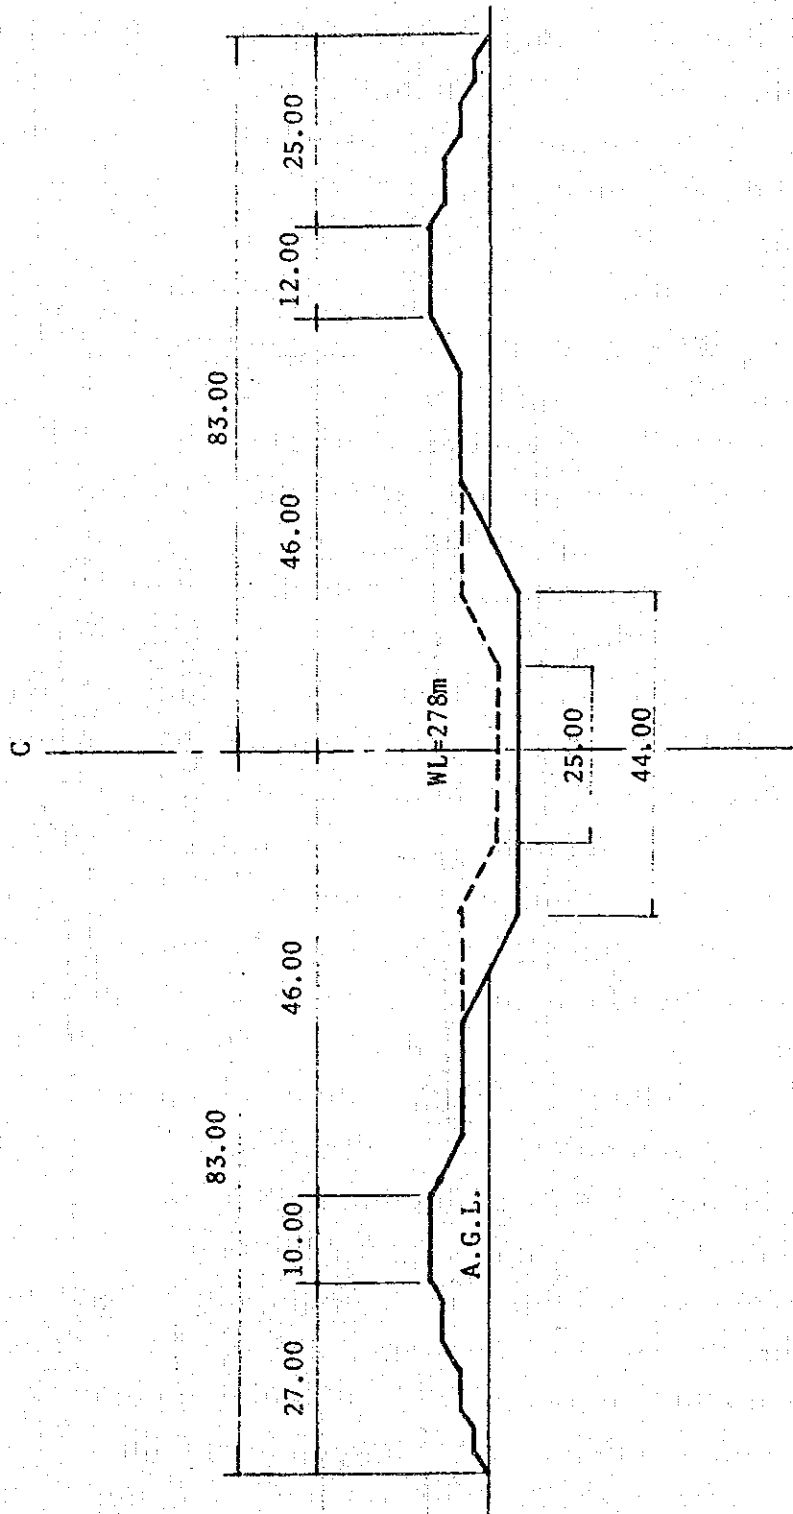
Cross Section of El Salam Canal at 48.75 Km in distance from the Dammiatta Outlet (after Mixing with Hadous Drainage Water)
